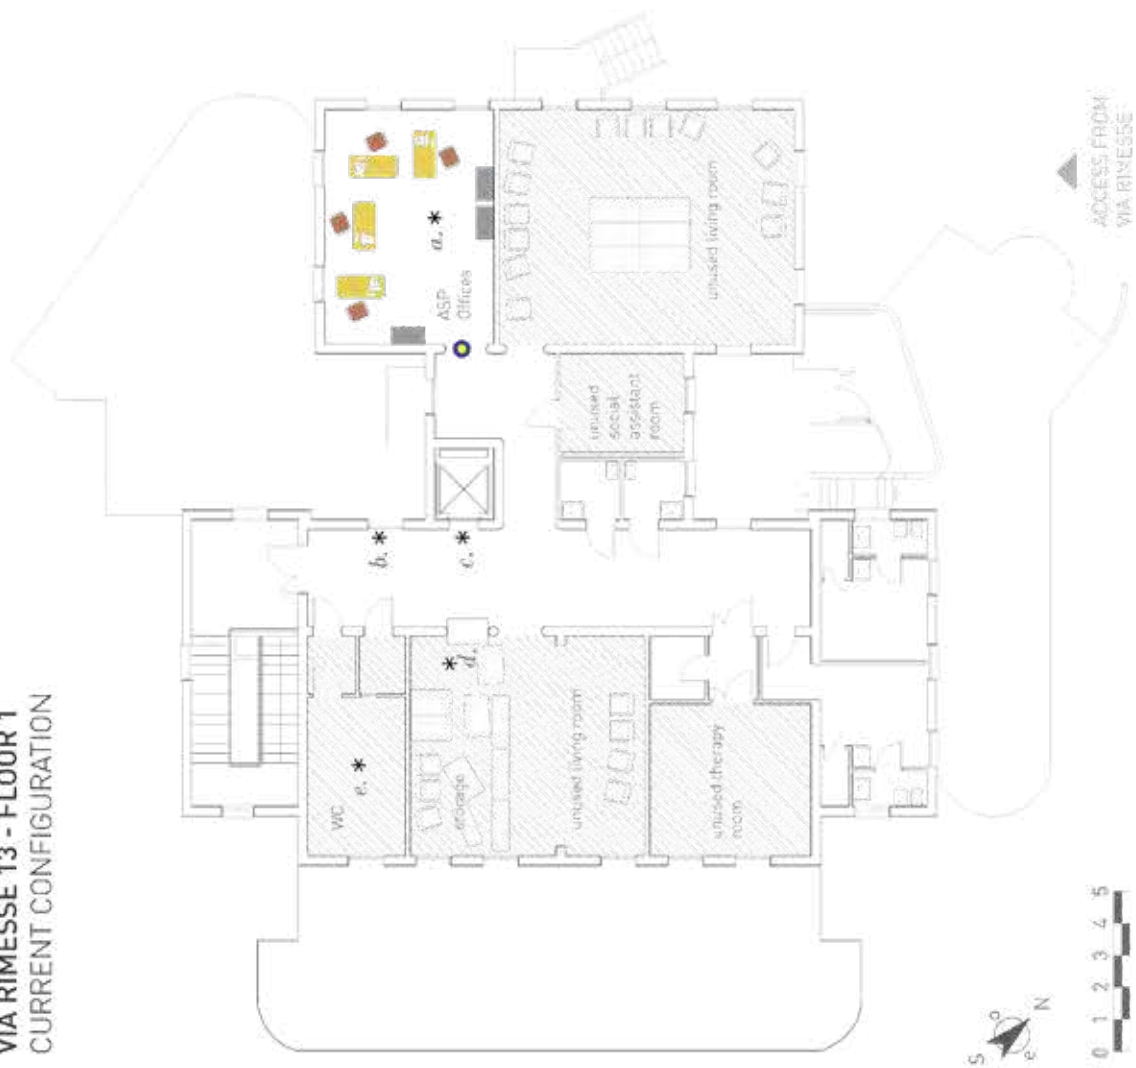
Plan of the building in via Rimesse 13, Bologna. Elaboration of the author from the direct observations and the cadastral plan.
